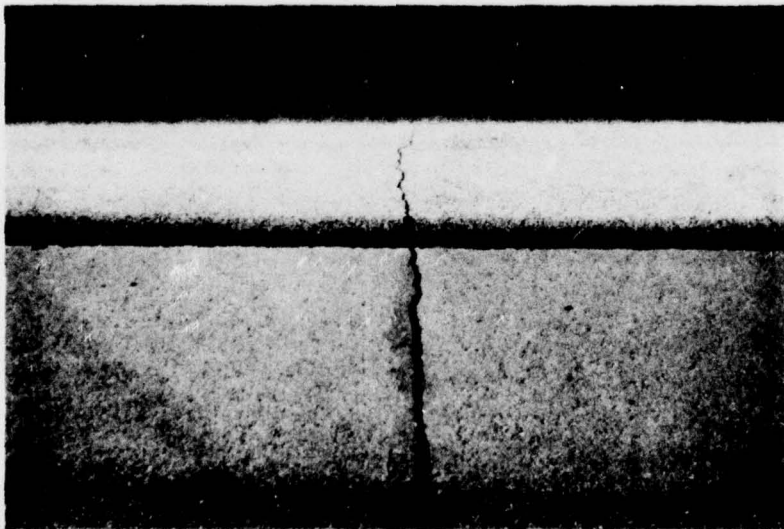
Cracks at edge of runway indicate that no sealing was done prior to placement of hot-mix plant seal in 1973
